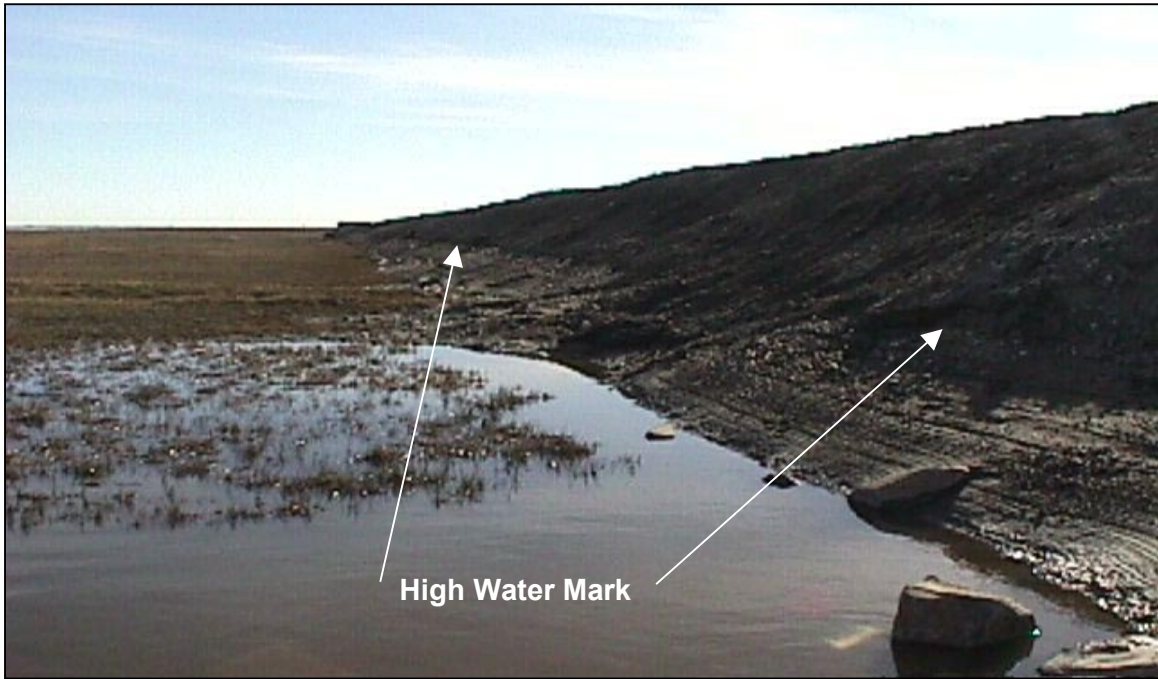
Looking east along the north side of the embankment on the road to CD-2 near culvert CN-5. (6/18/00)
